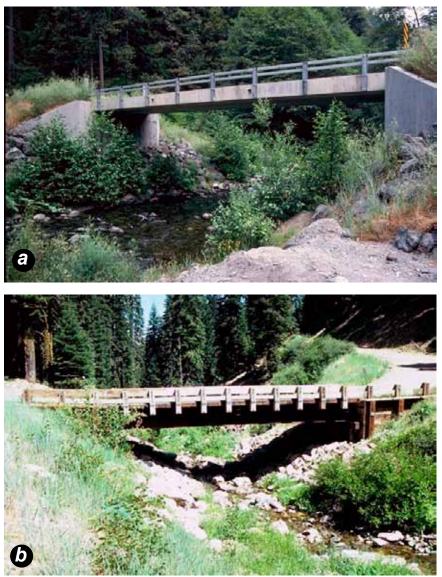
Typical (a) concrete and (b) timber glue-laminated bridges with spill-through abutments.
